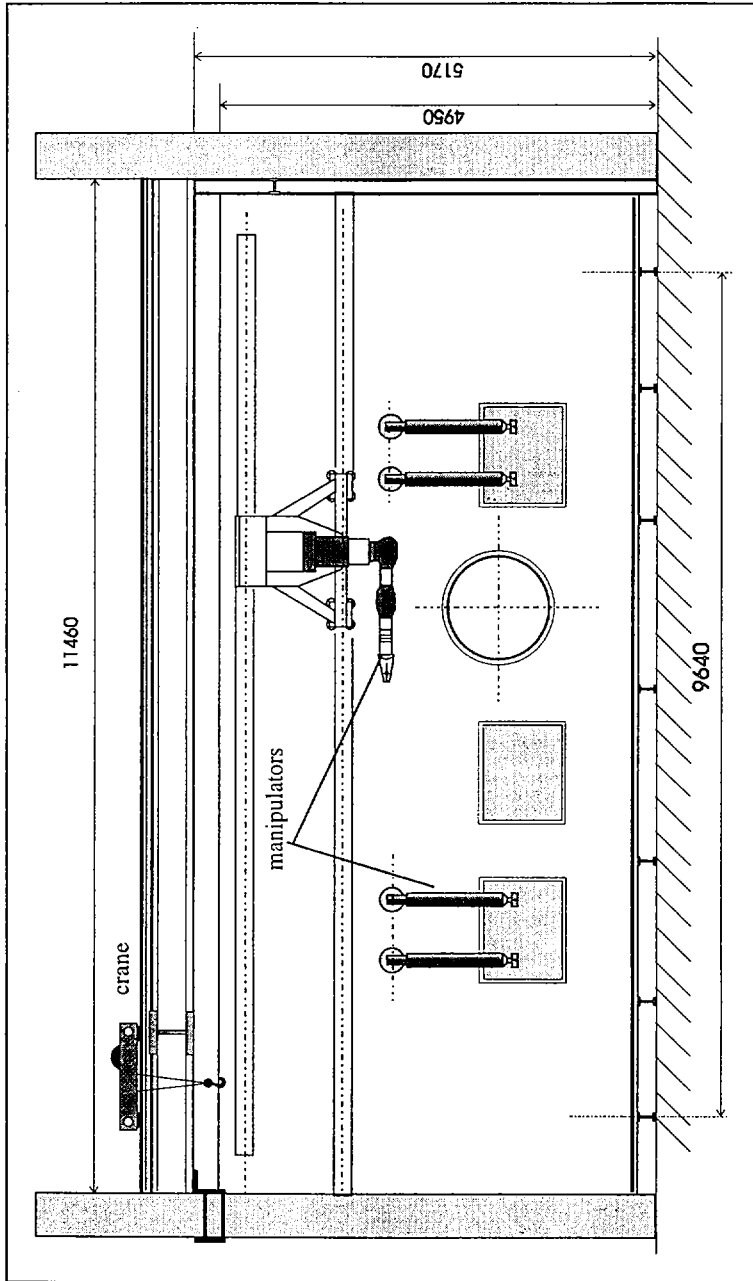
DRP hot cell equipment (dimensions in millimetres).
